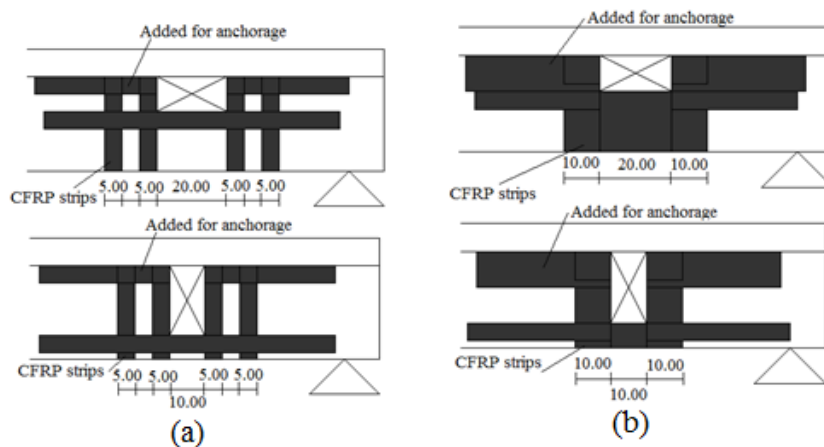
Strengthening techniques; (a) CFRP strengthening for TS1, TS2, AS1, and AS2 beams, and (b) CFRP strengthening for TP1, and TP2 beams.
